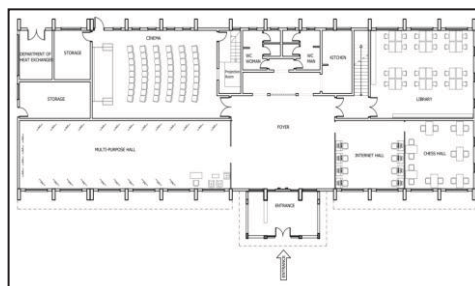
The floor plan of the Cultural Center (Source: İSDEMİR Archive, 2012 and revised by author)
